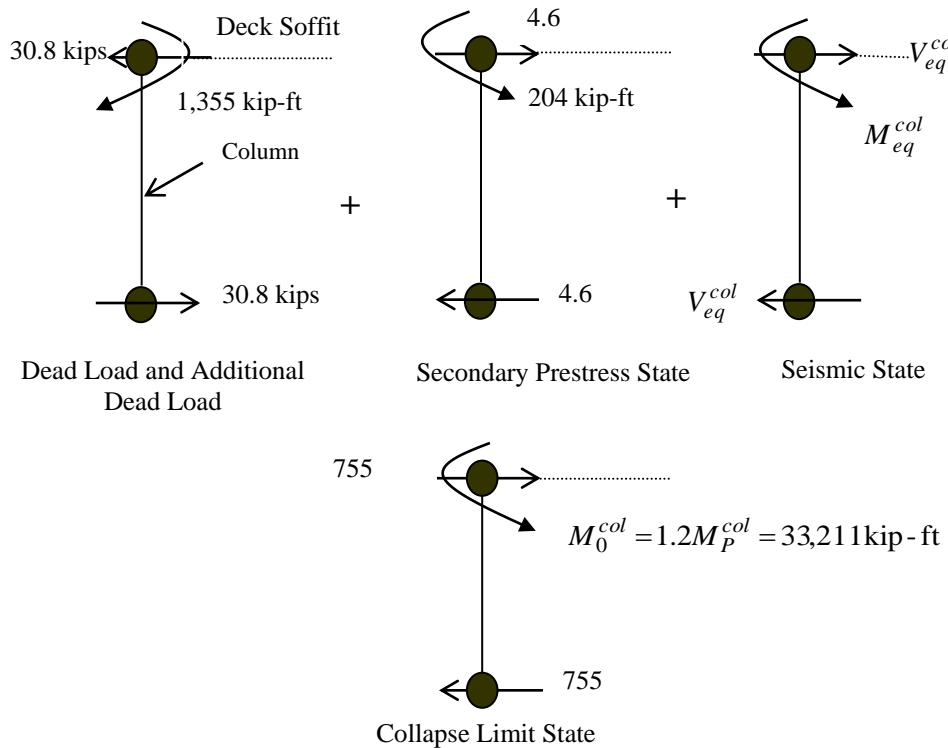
Superposition of Column Forces at Bent 2 for Loading Case “1”
